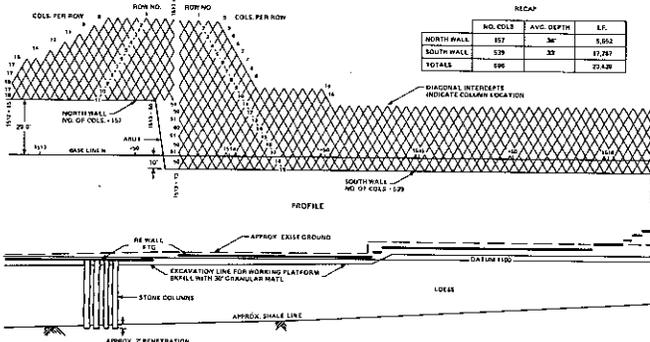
Plan and Profile Views - Sioux City, Iowa, Project
